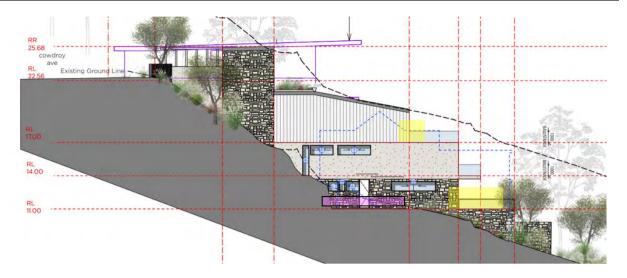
Eastern elevation of proposed dwelling indicating window arrangements and balcony edges where slatted/louvre screens are recommended (highlighted yellow)
